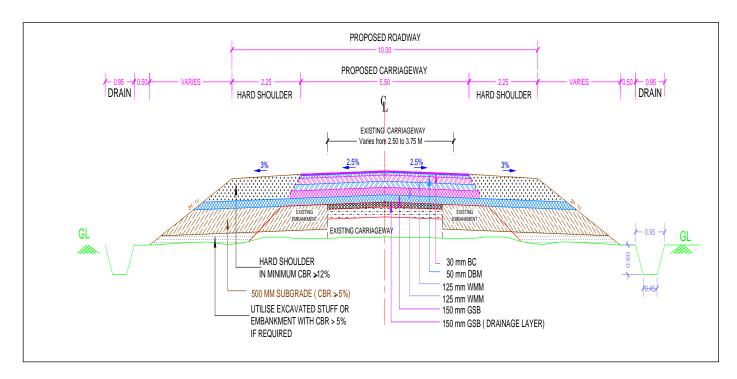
Typical Cross-section of Flexible Pavement in Rural Areas
